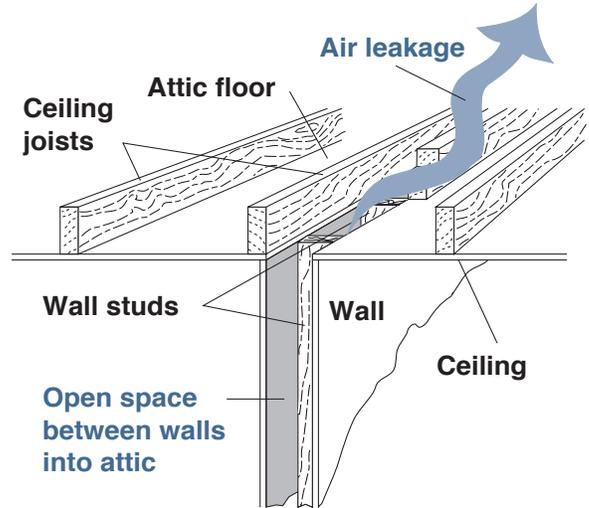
With "balloon framing," open wall cavities allow air and heat to flow up into the attic.
